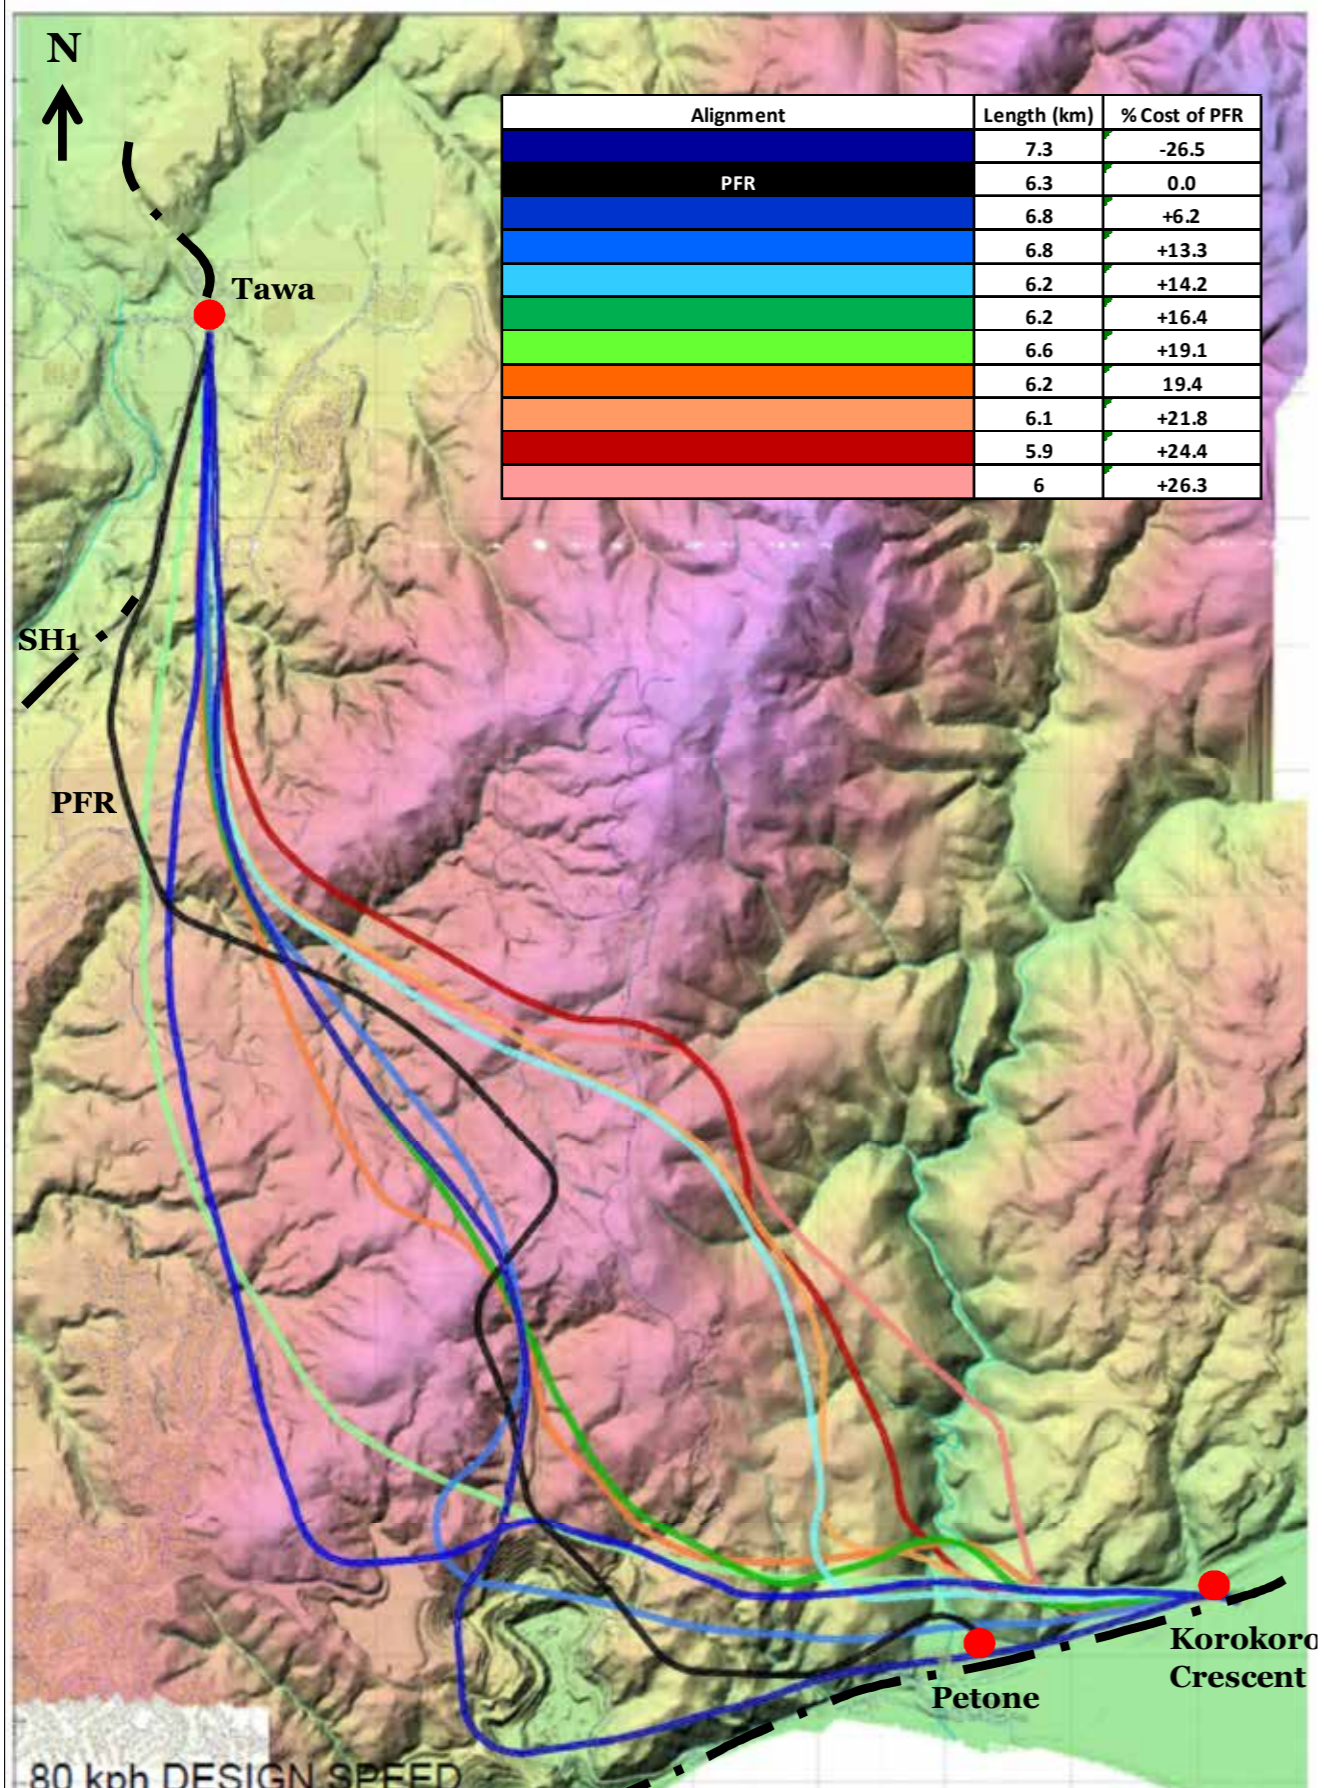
Alternative Connection 2 - SH2/Korokoro Crescent
